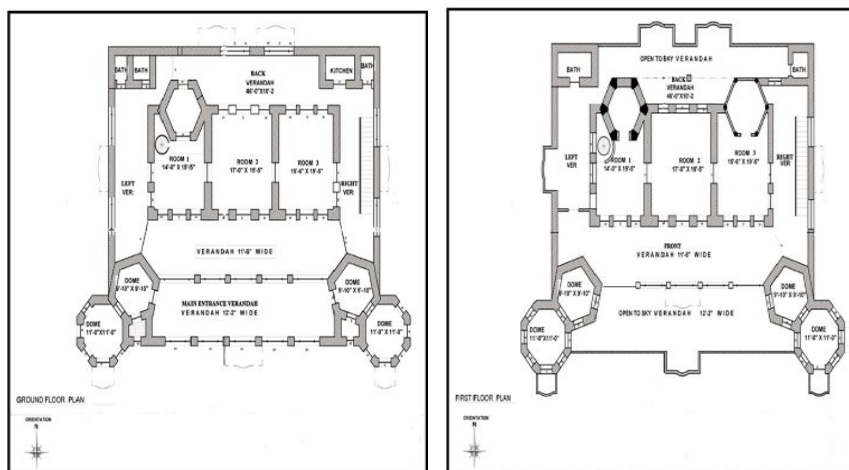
Existing floor plans of "Sahib Mahal Badin"
